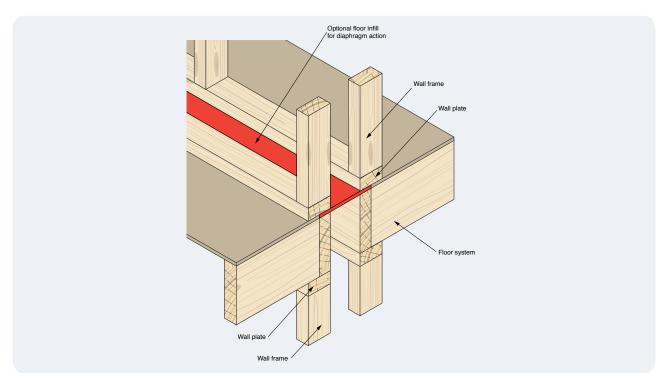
Use of a floor infill member between floor systems over a discontinuous wall to maintain floor diaphragm action.
